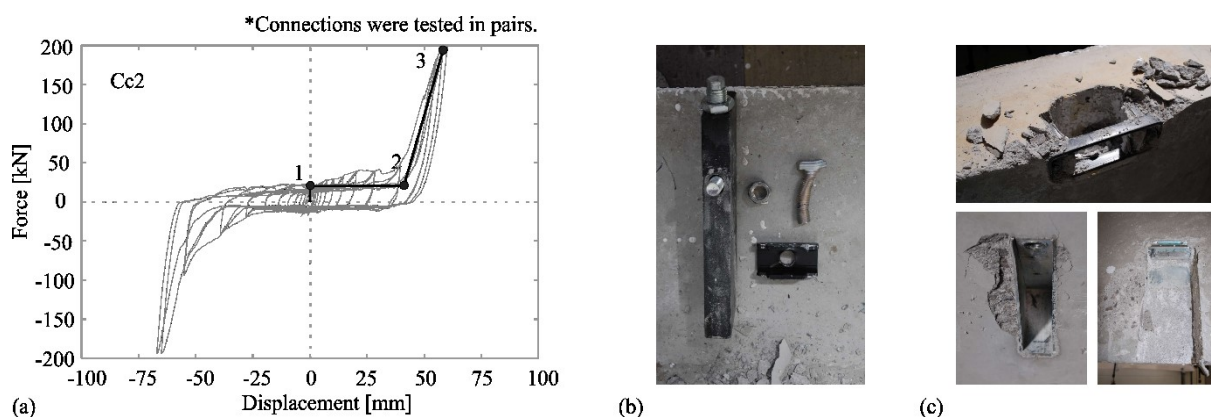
Test of the complete fastening system: (a) typical hysteretic response of the complete fastening system, (b) damaged connection parts after the test and (c) damaged concrete around the connections after the test
